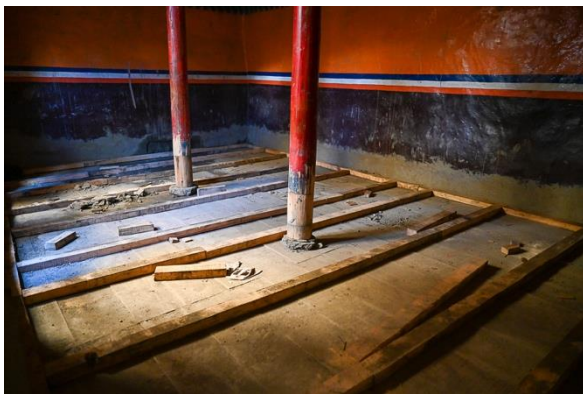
The installation of wooden frames in the VIP room to support the floorboards.
